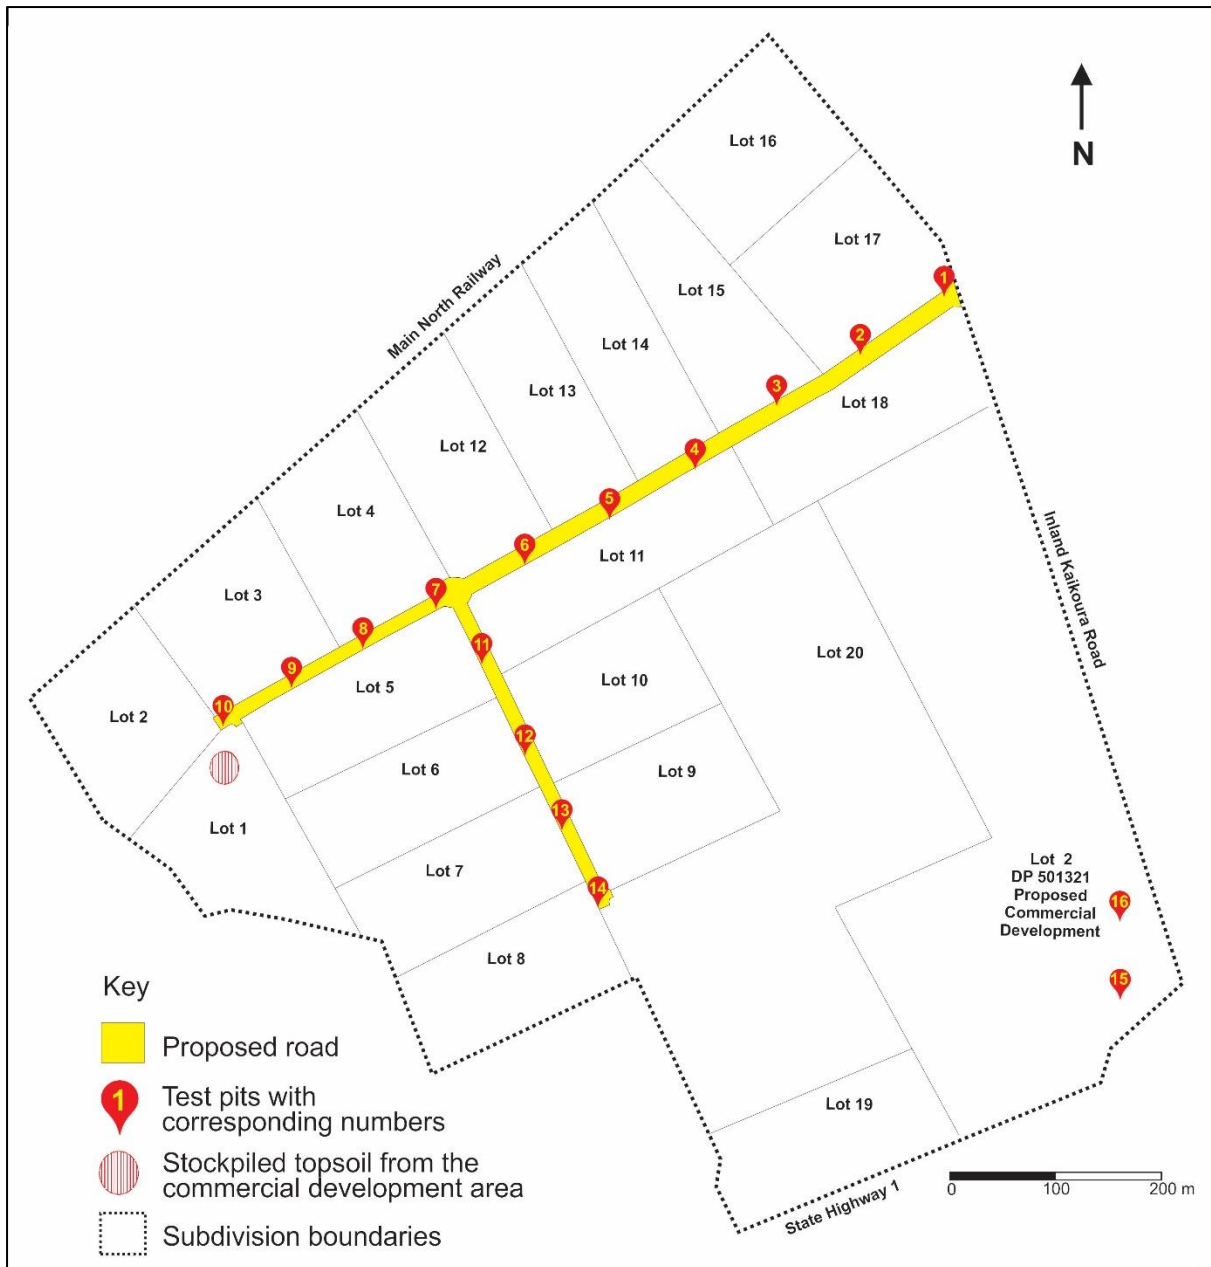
Plan of the assessment area showing the location of the 16 test pits, and location of the stockpile of topsoil stripped from off the proposed commercial development. Image: Angel Trendafilov.
